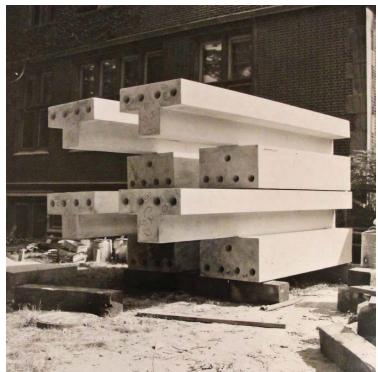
Pile of columns on construction site waiting to be erected. (The Architectural Archive, University of Pennsylvania, 030.IV.A.490.9.2)
